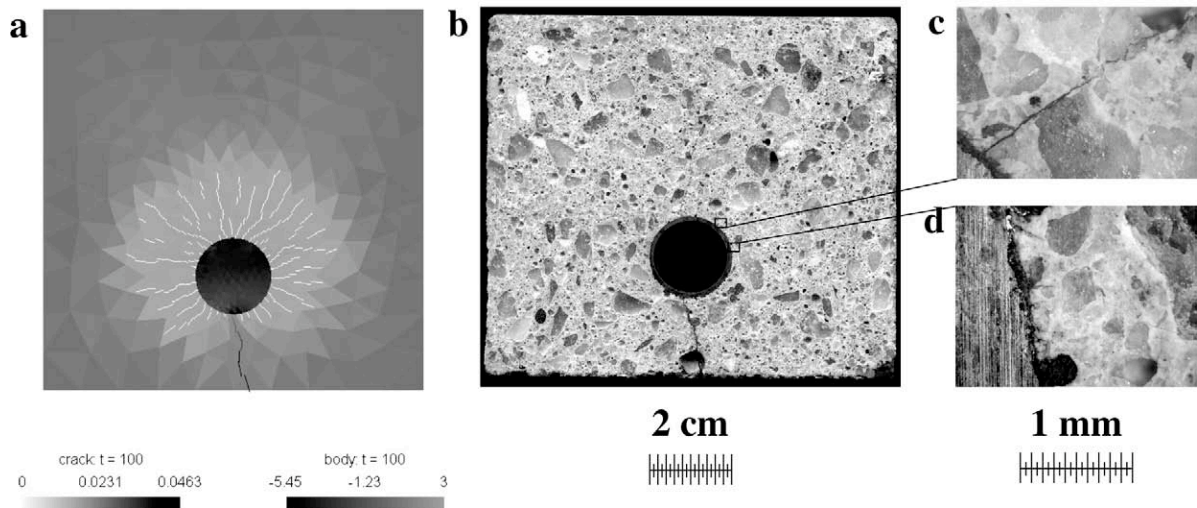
(a) Crack pattern in numerical simulations using the expansion joint element. Crack width (mm) and maximum principal stress (MPa). (b) Crack pattern in accelerated corrosion tests. General view. A main crack is observed. (c) Detail of a secondary crack. (d) Detail of some radial micro-cracks.
